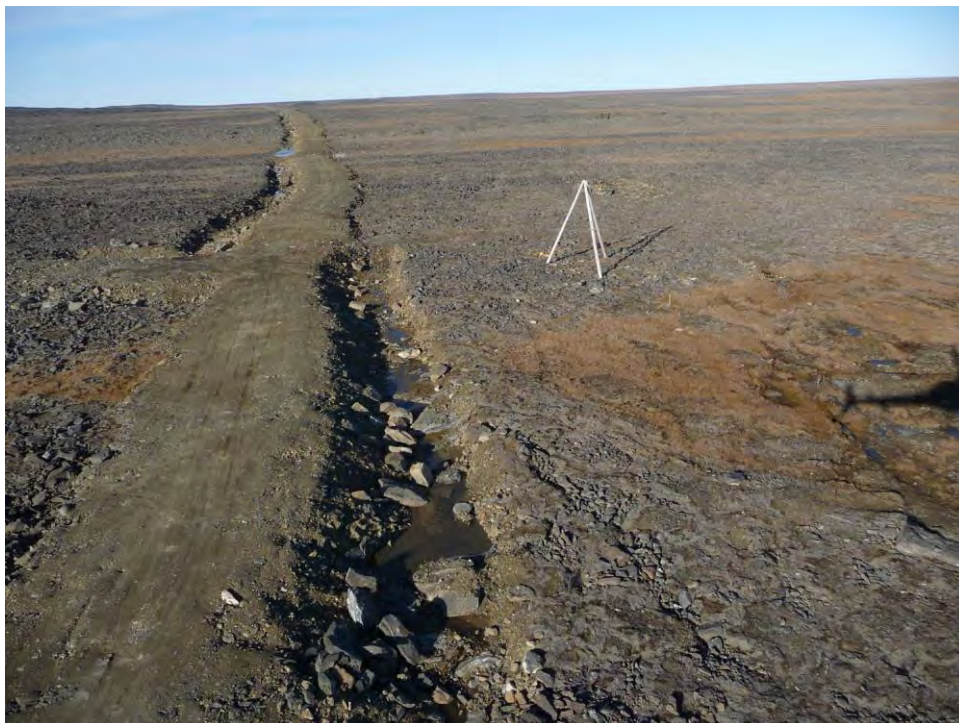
Site K-28: Road and tripod. Active Canadian Royalties site (September 17, 2011)
